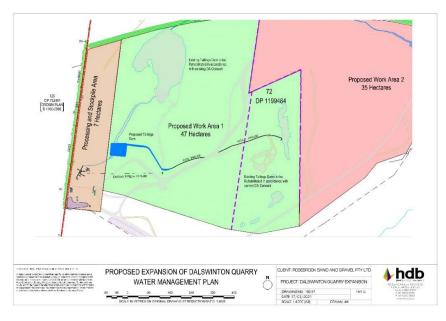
Proposed Water Management Plan Source: HDB Town Planning and Design
